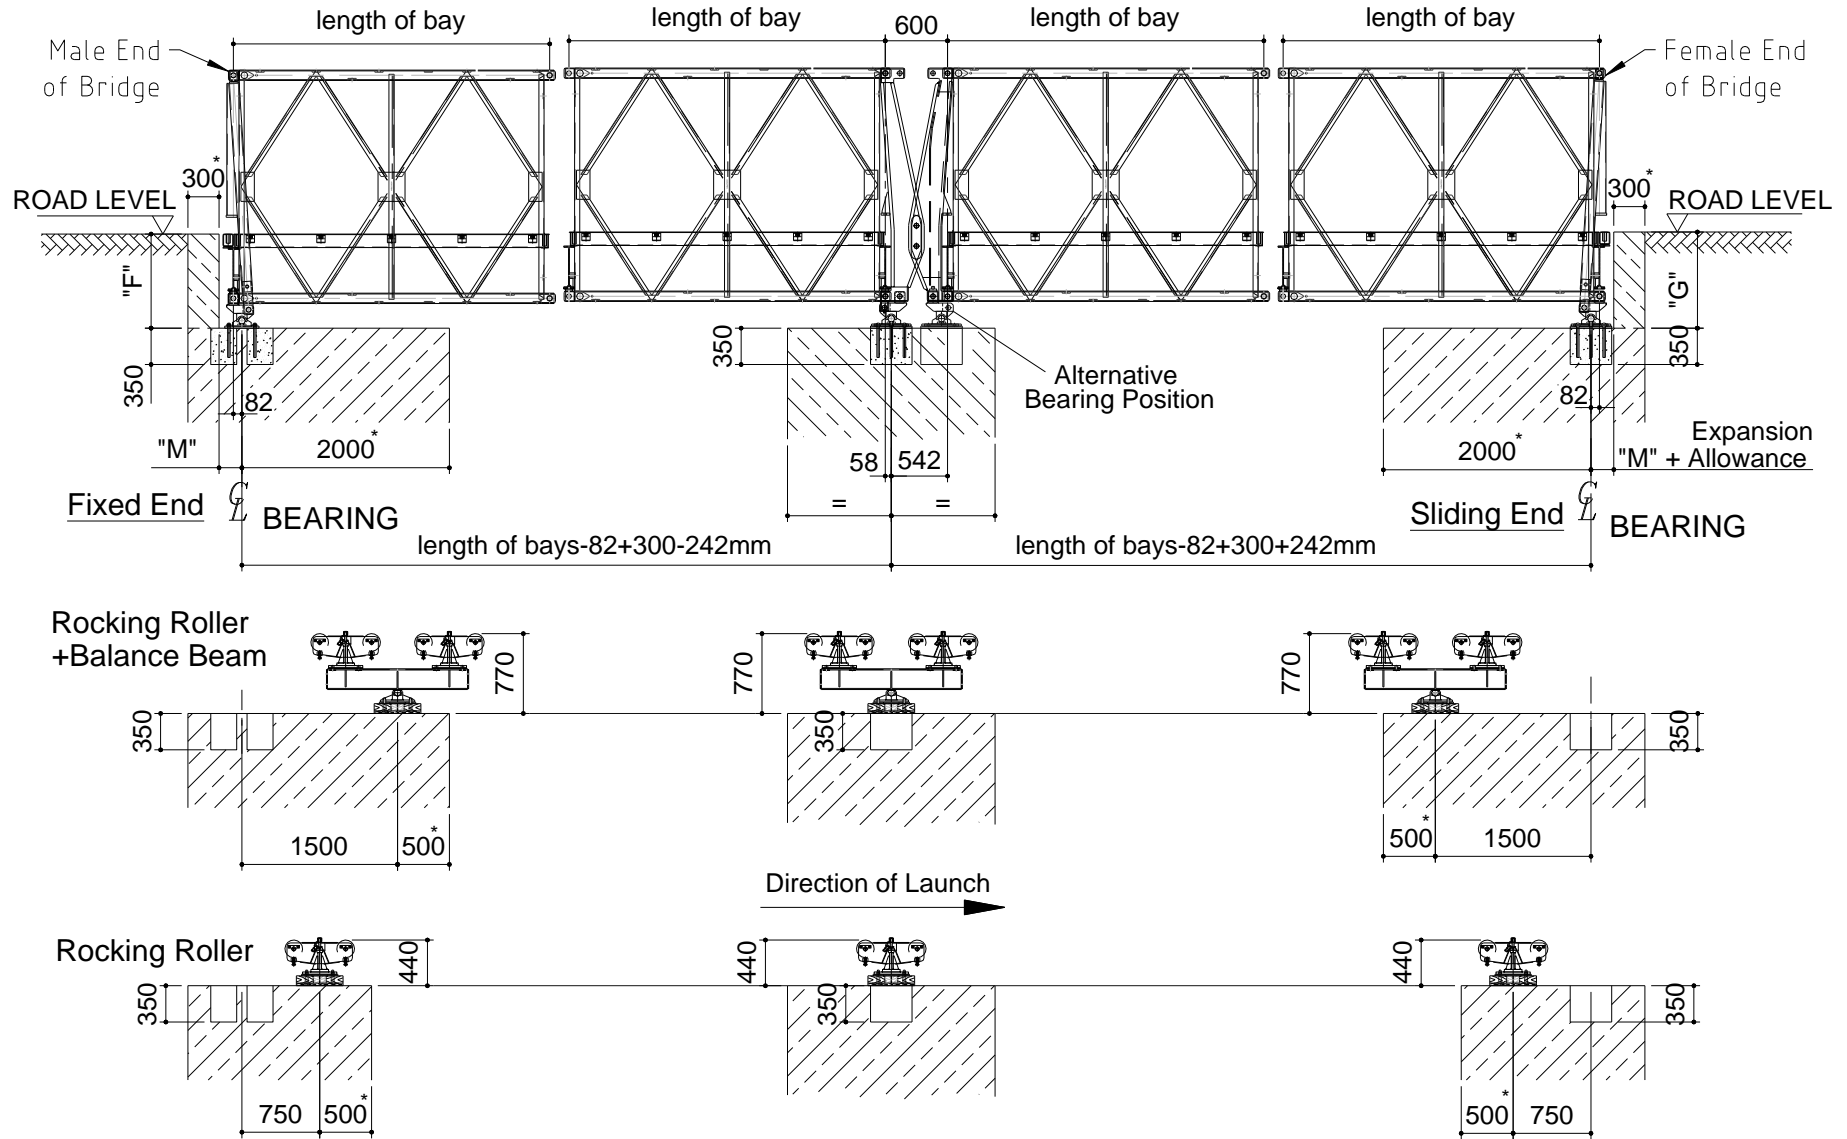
ABUTMENT, BEARING PLATES AND ROLLER LAYOUT FOR SPAN JUNCTION BRIDGES – SIDE VIEW
